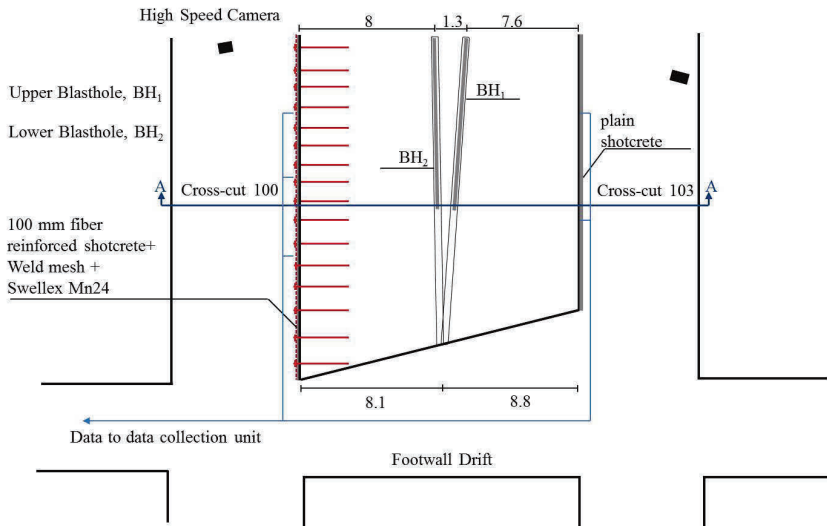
Location of blasthole with respect to the test wall in Test 6 [Unit: m]
